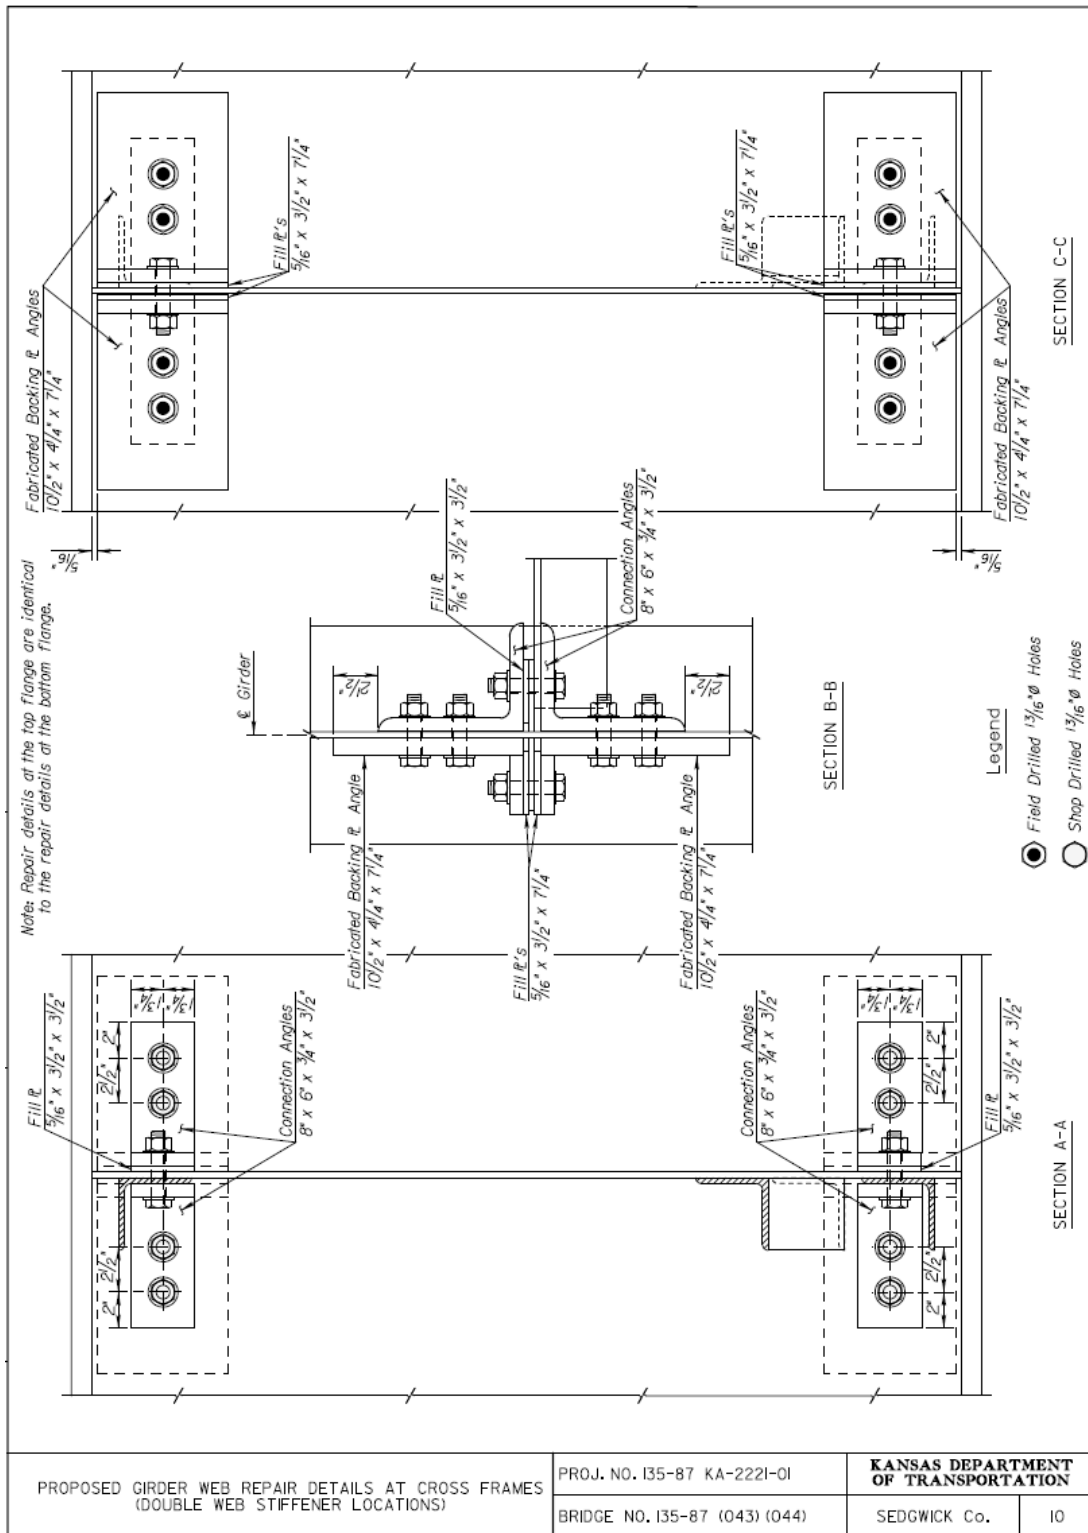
Proposed girder web repair details at cross frames (double web stiffener locations).
